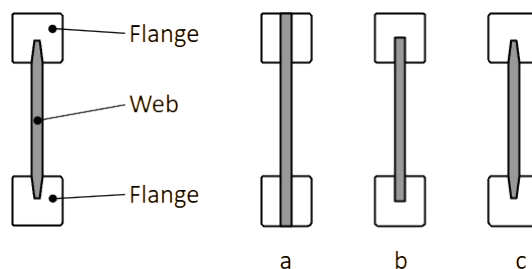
I-joist components (left) and different shapes (right): (a) glued thin webbed beam, (b) rectangular groove, (c) trapezoidal groove (I-Joists, n.d.).
